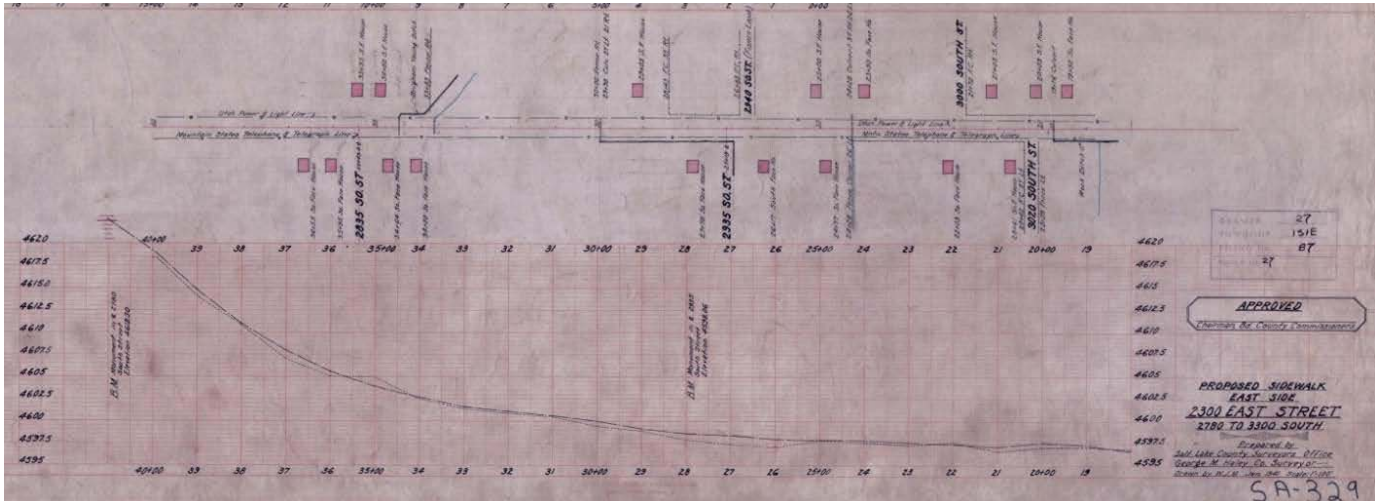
Proposed Sidewalk Plan for 2300 East, 1941
